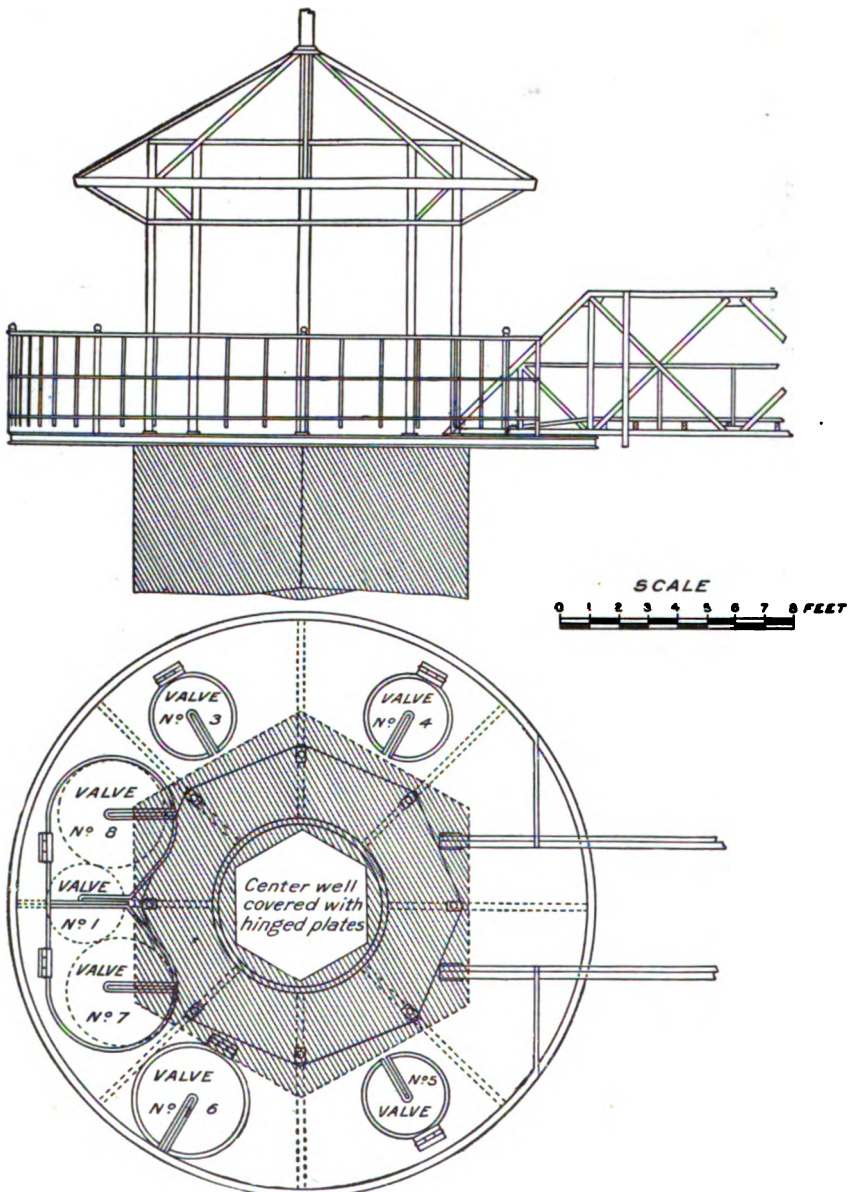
DETAILS OF TOWER OF SWEETWATER DAM.
